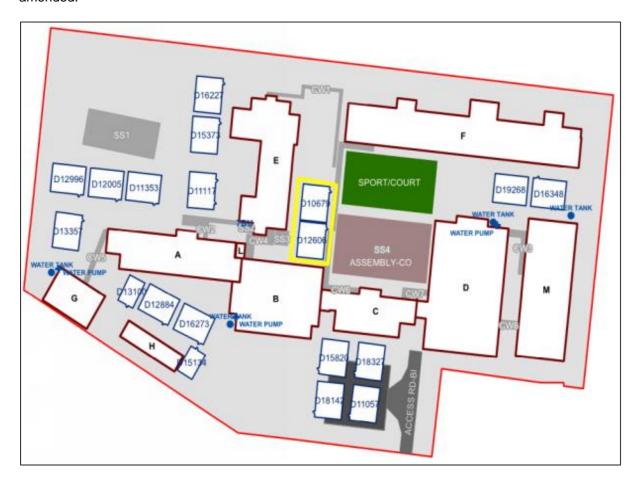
| South site showing building names (Source: Dept of Education Modification Application 2021)
